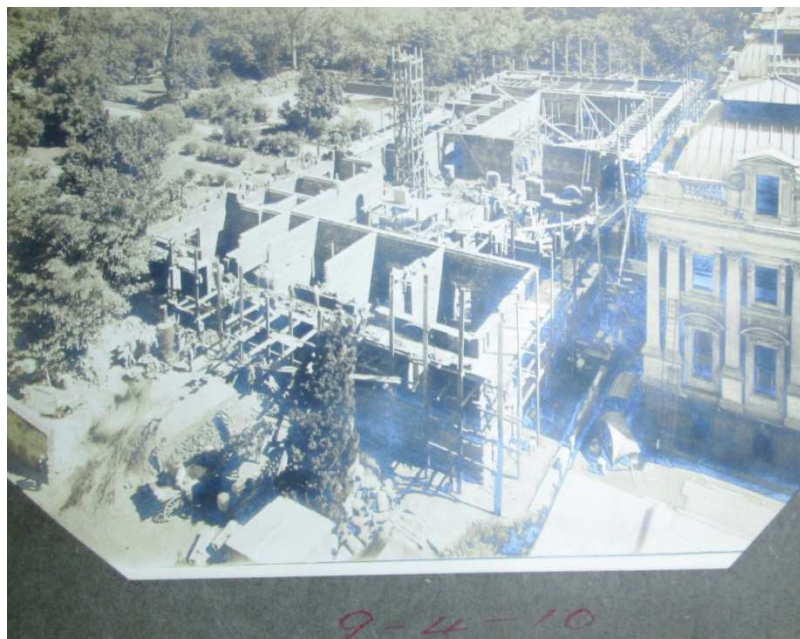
Old Assembly building built next to the Houses of Parliament, built in 1910
